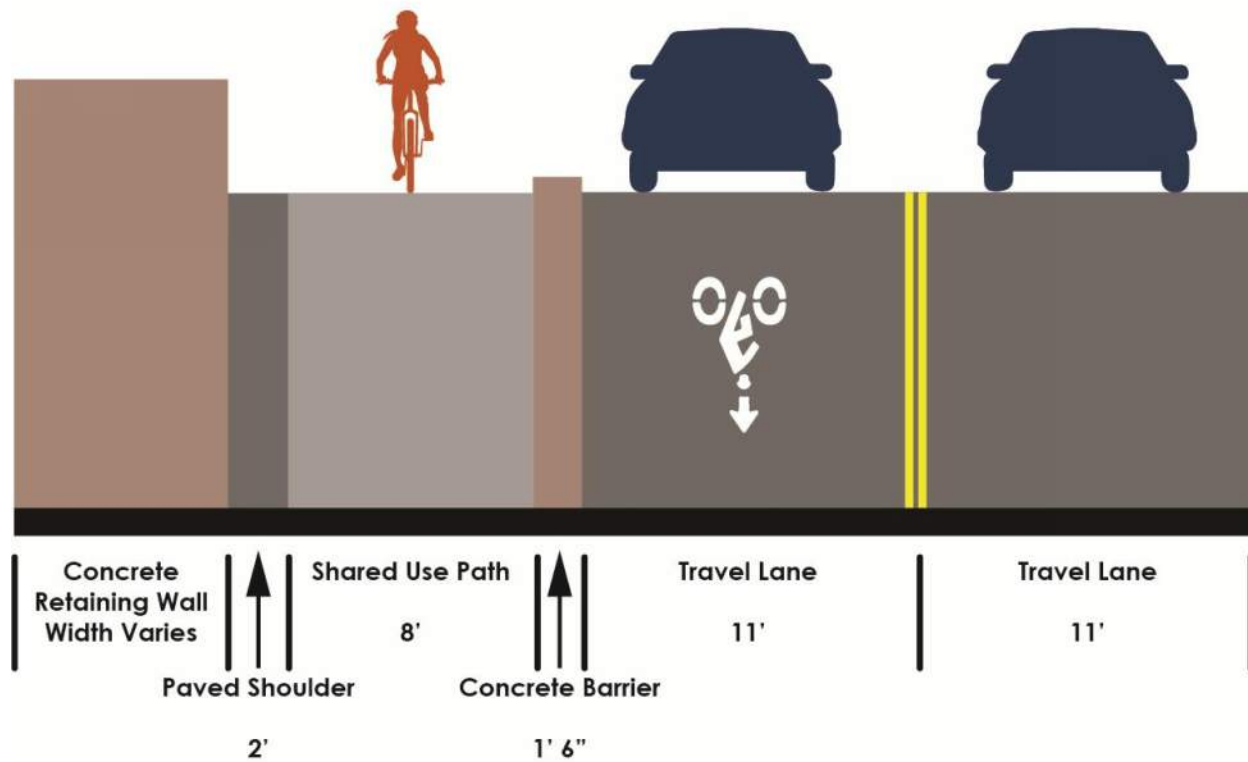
Mill Creek Road Typical Section – Recommended preferred alignment on the upslope (north/west) side of the street
